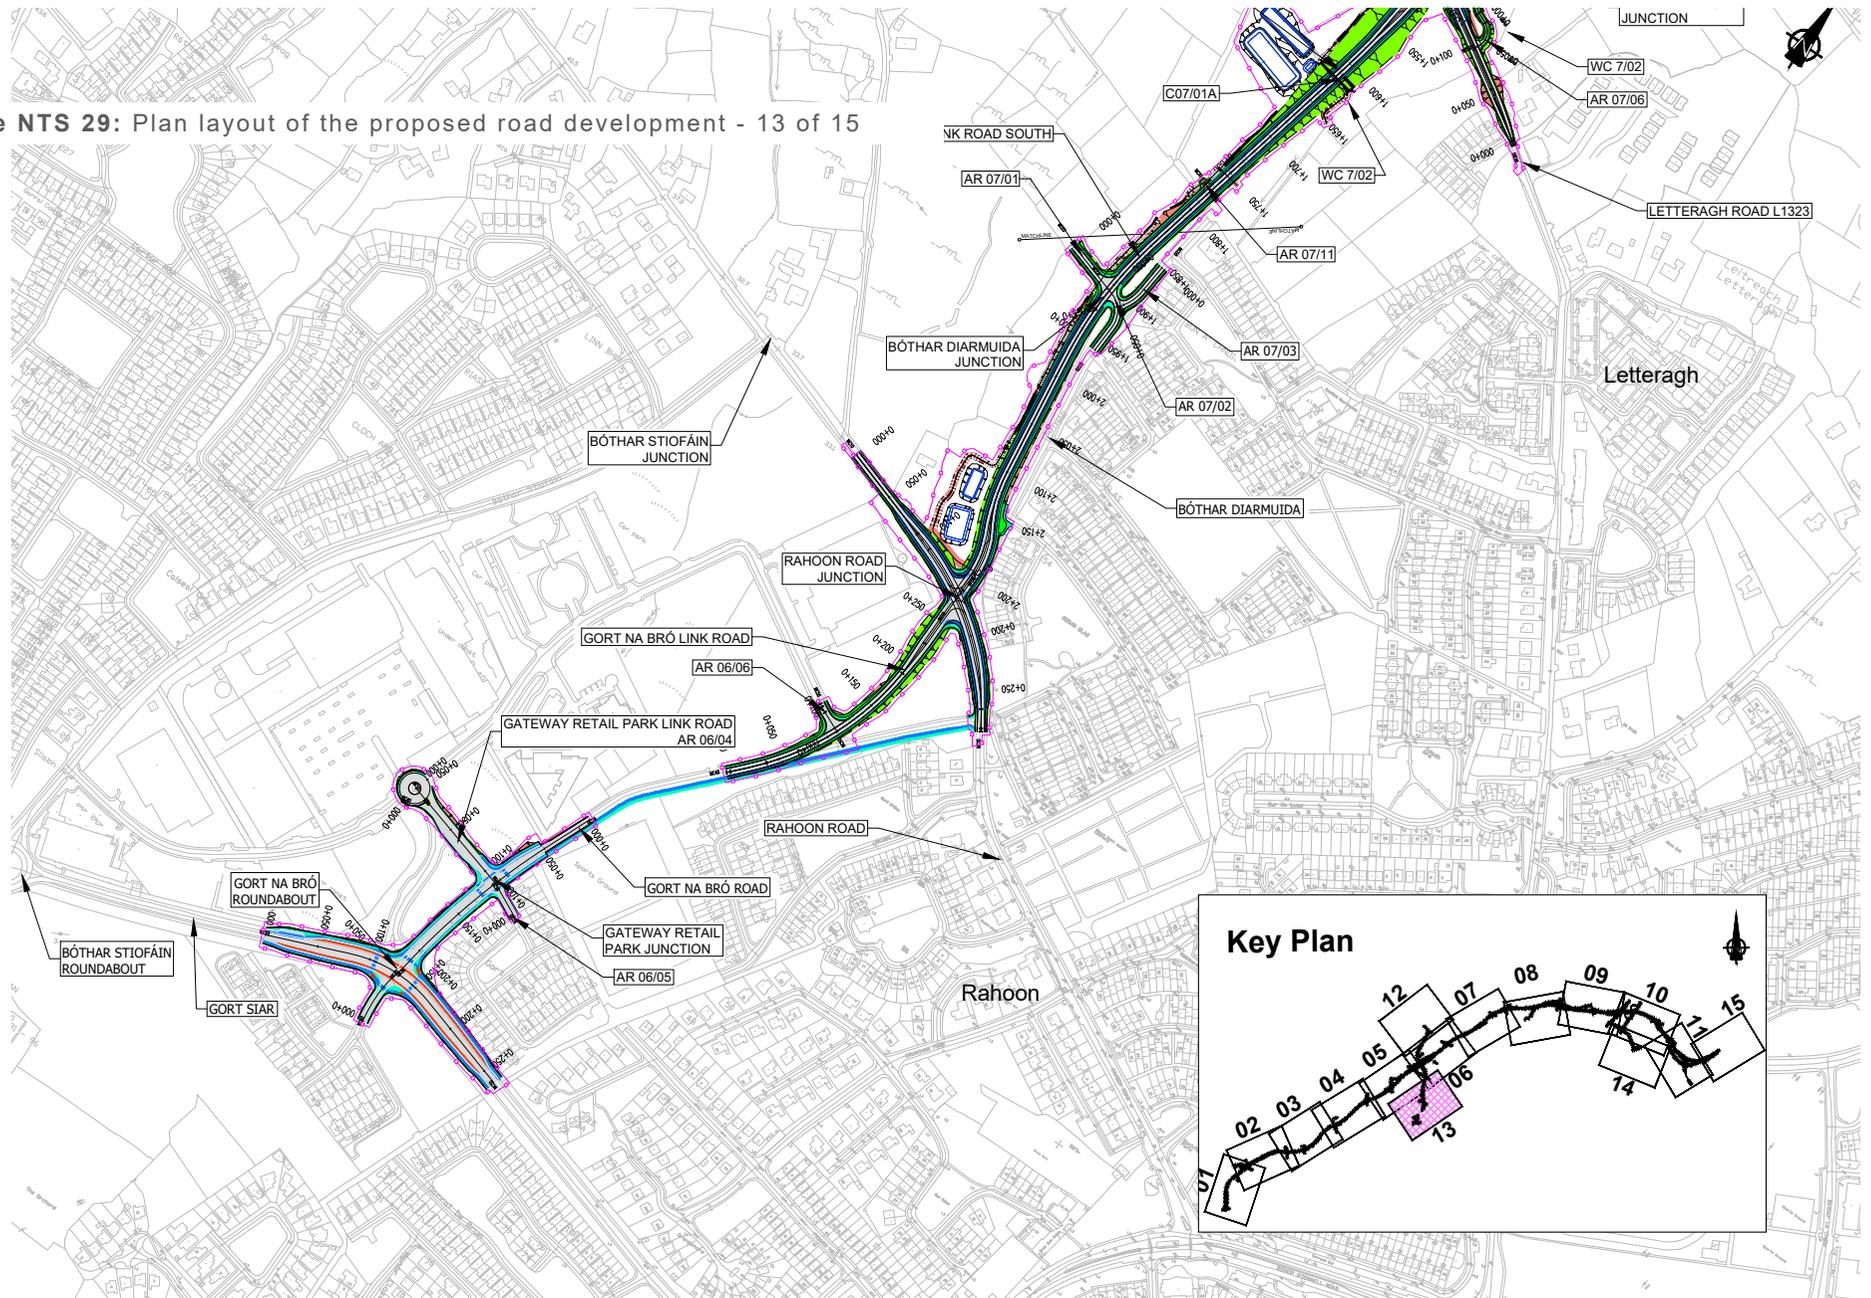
Plan layout of the proposed road development - 13 of 15
